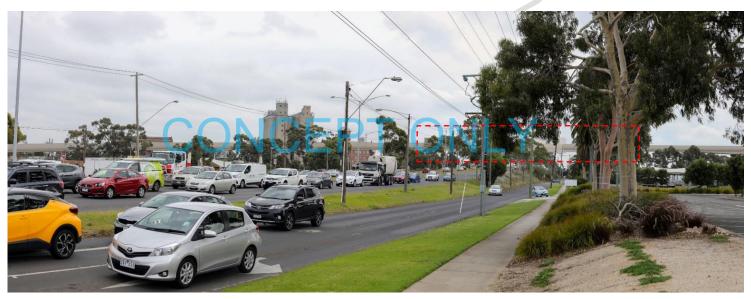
VP12 preliminary rendered photomontage indicating view looking west toward Ballarat Road rail-overpass and the MAR Viaduct (at two years post construction) Indicative location of Albion Gateway shown by red dashed line.
